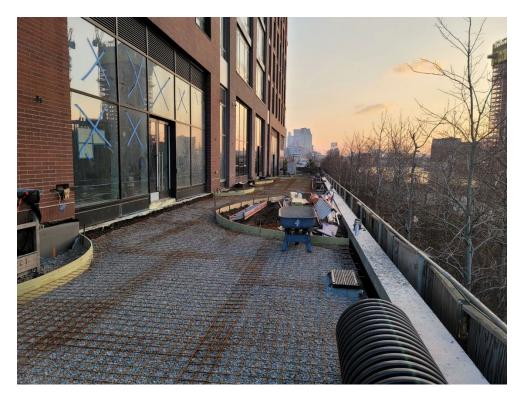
Photo of the permanent Site cover system installation (looking northeast).
